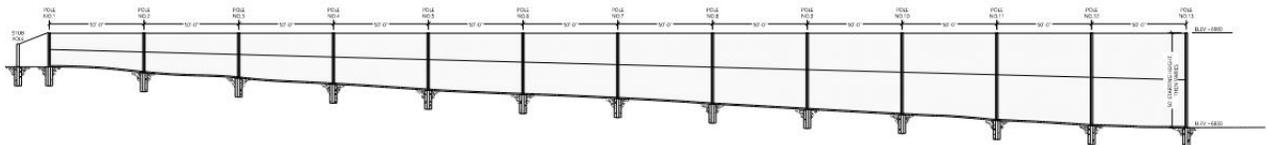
Proposed profile of Thaynes net from the Applicant's proposed plans (Attachment 1).
